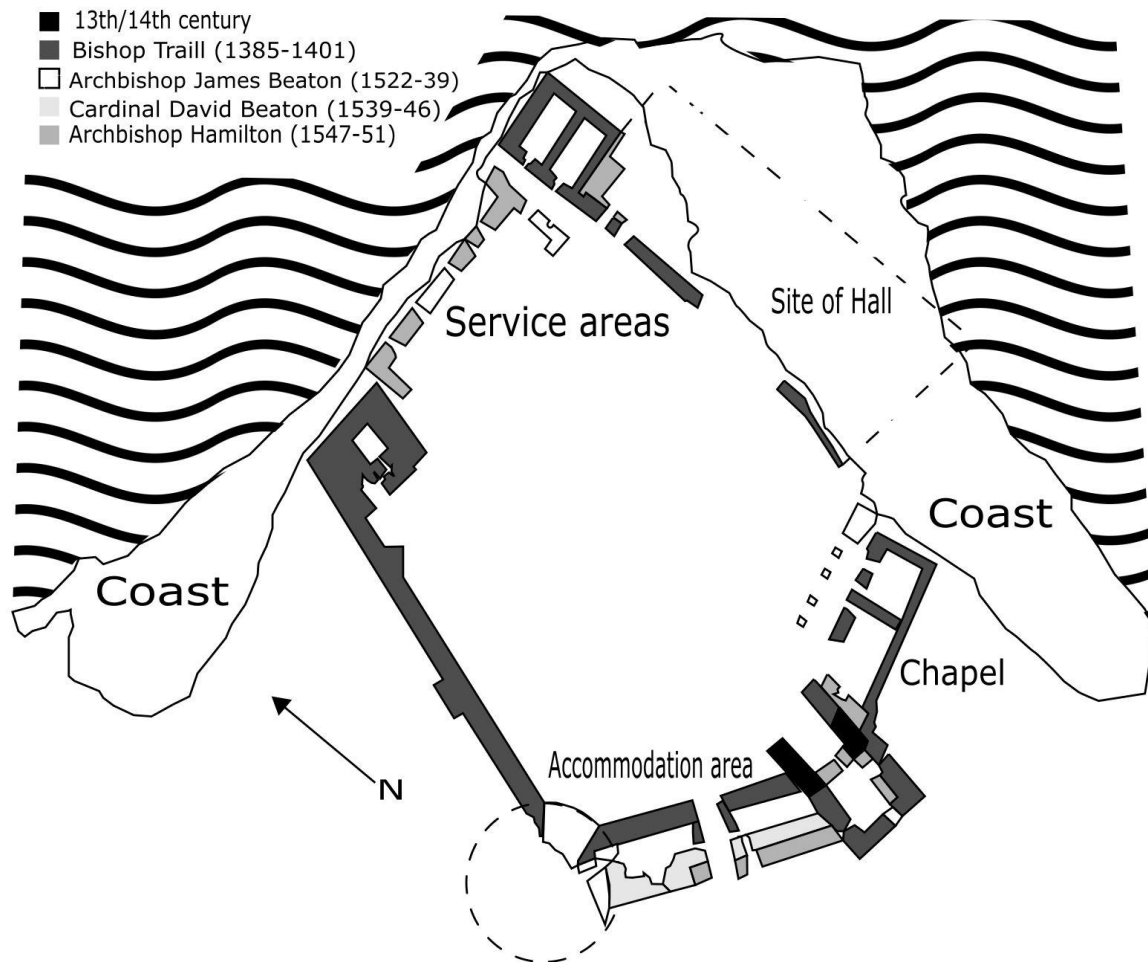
Phased plan of St Andrews Castle, including structural work constructed by three bishops in this study: James Beaton, David Beaton and John Hamilton in the period 1522-1551. This figure also shows the location of lost buildings, notably the hall that has since been lost due to coastal erosion. Based on a plan by Historic Scotland (Tabraham and Owen 2010)
